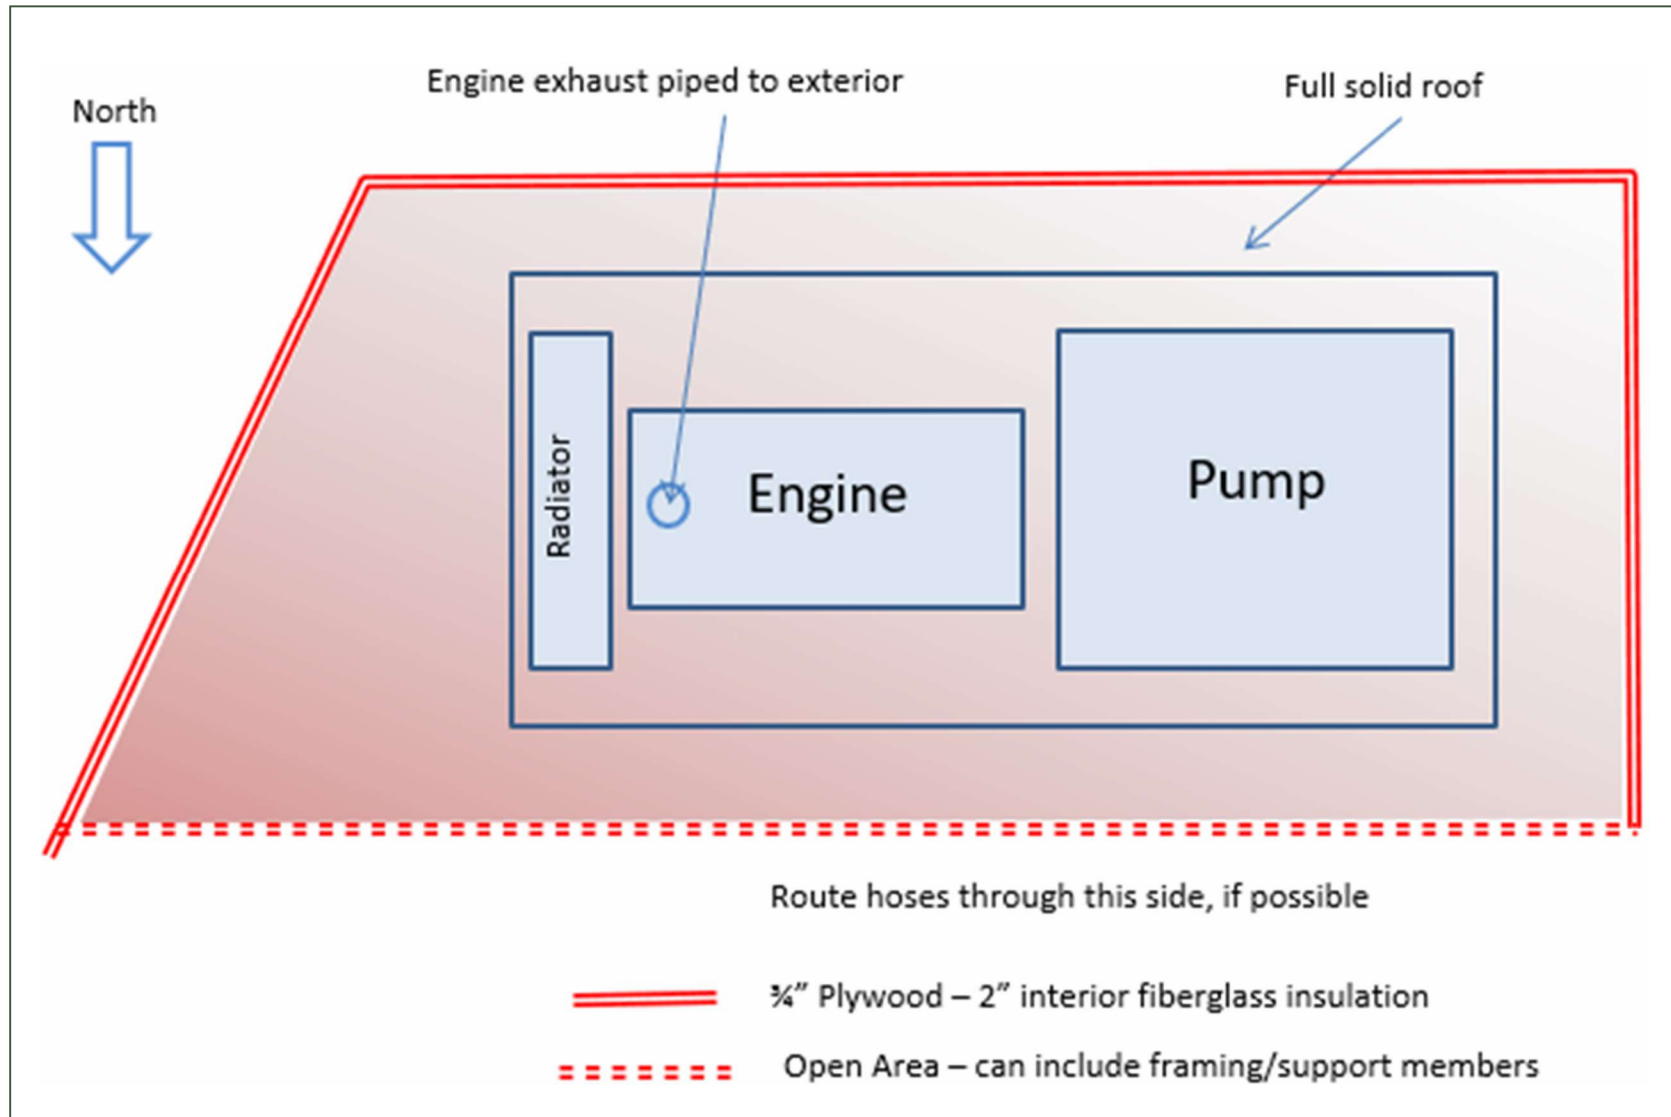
Typical Enclosure Layout for Diesel Powered Pump or Welder Equipment Axis Oriented East/West
